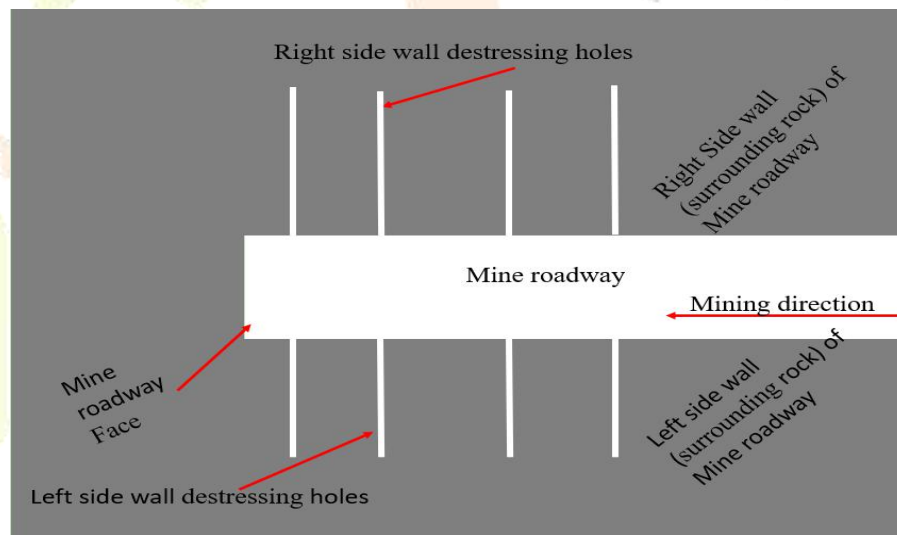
Schematic diagram showing side wall destressing holes pattern of mine roadway
